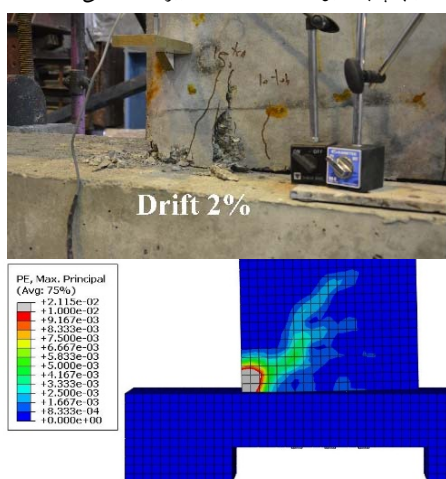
Concrete damage at wall toe corresponding to 2% drift, SWED
